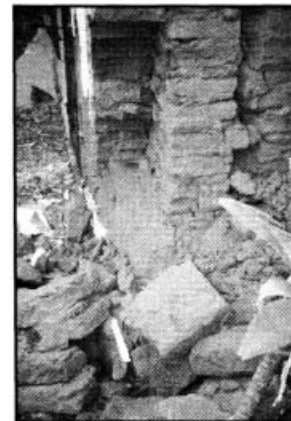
Moisture damage in this kitchen wall at the Andres Pico Adobe contributed to the collapse of the corner of the building.
